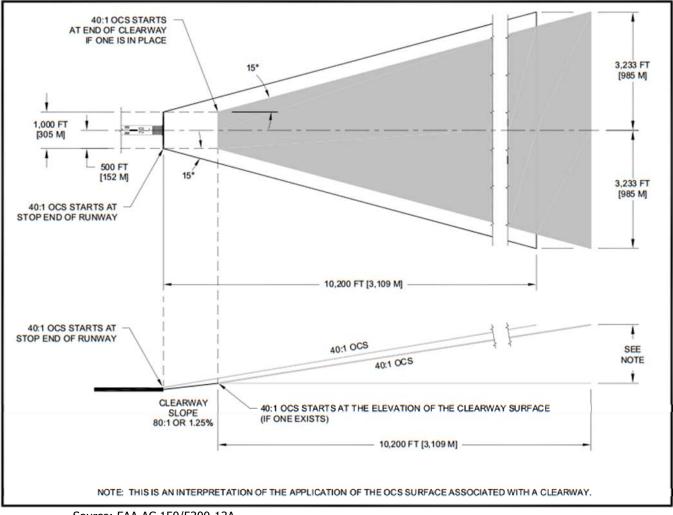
DEPARTURE SURFACE FOR INSTRUMENT RUNWAYS (40:1)
